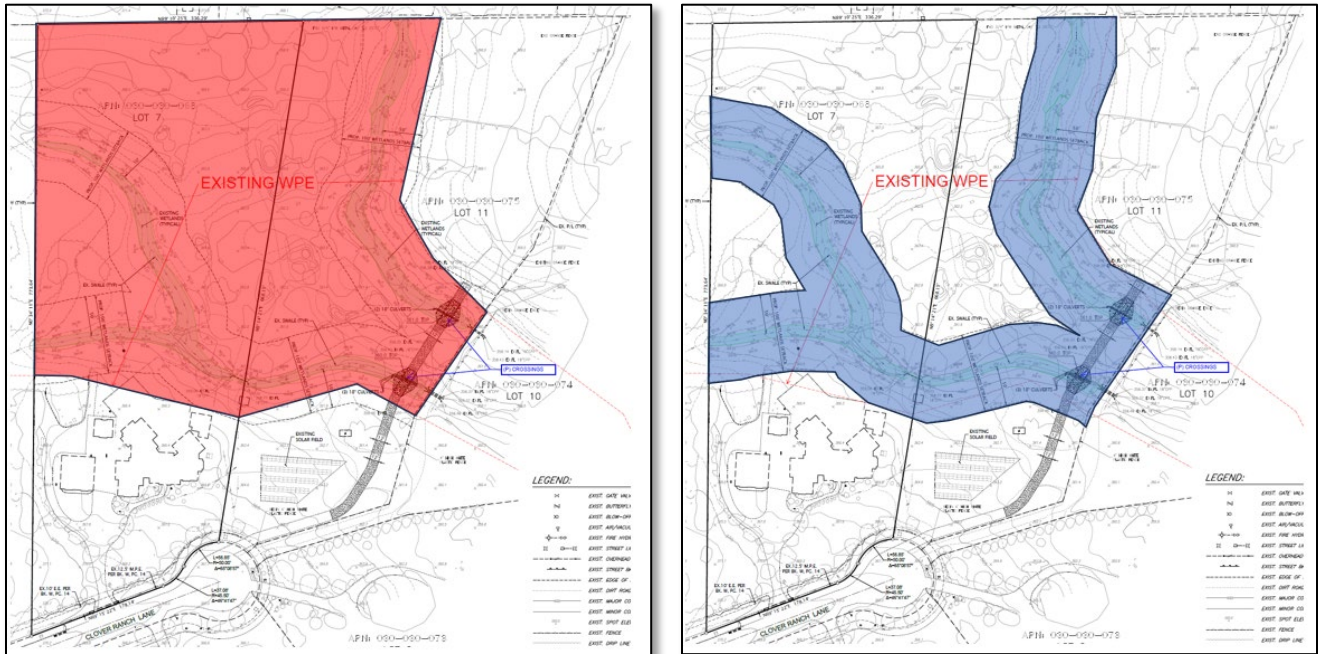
Existing and proposed WPE (Left-Existing, Right- Proposed)
